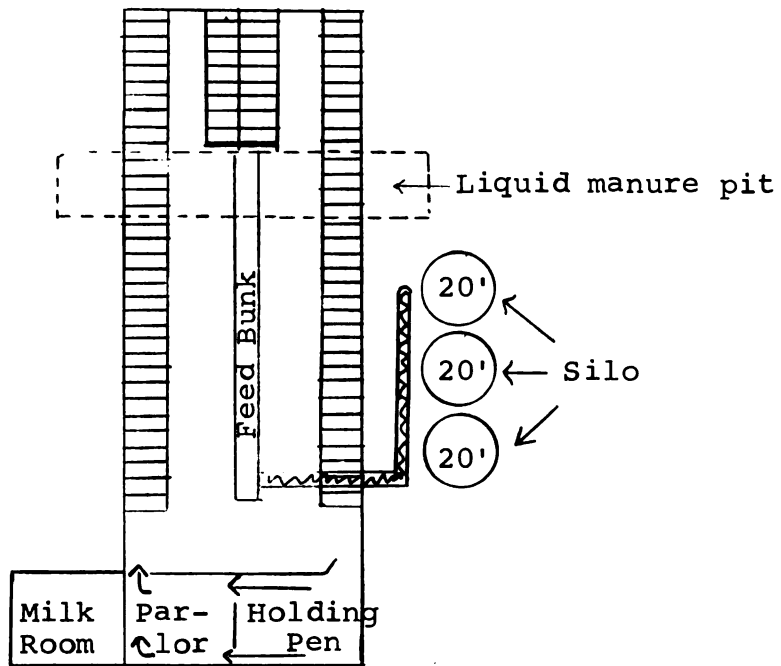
Eighty cow covered free-stall barn. All silage feeding, no hay. Milking, resting, and feeding area are under one roof. Eaves and ridge of roof are open at all times to provide adequate ventilation. In summer doors on sides and ends of building are opened to provide more air movement.
